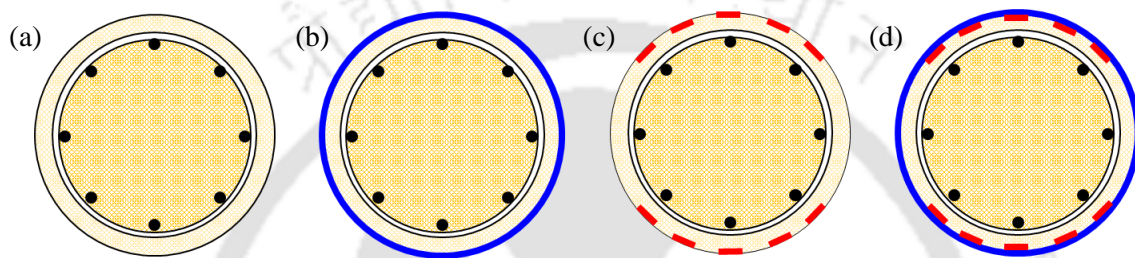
Cross-sectional view of test specimens (a) C (b) H (c) EA (d) EAH
